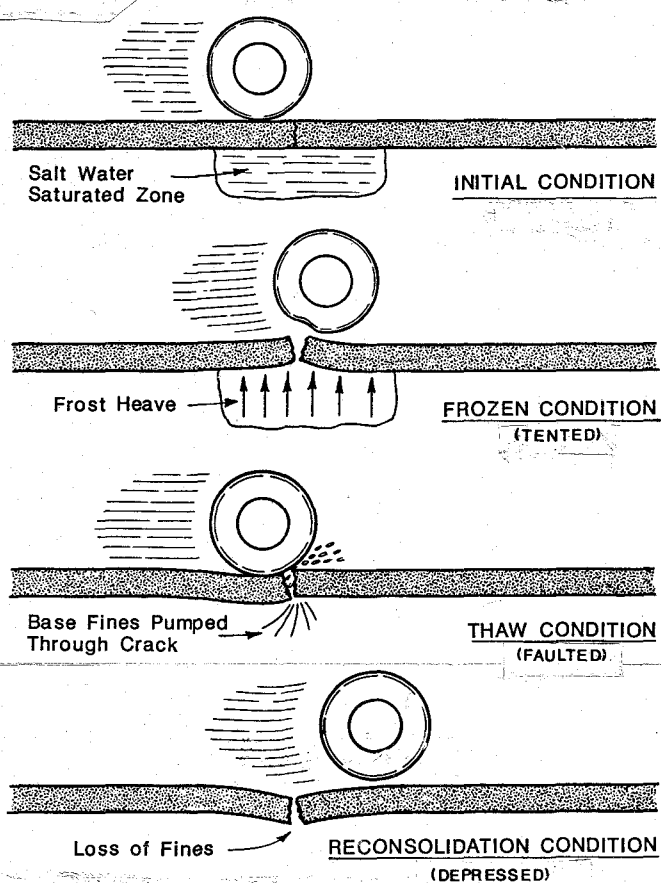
Pavement roughness developing from a transverse crack.
